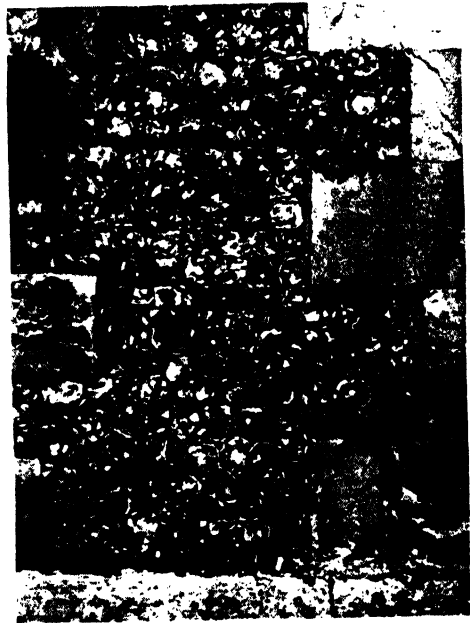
FLINT WALLING, WITH WROUGHT-STONE QUOINS
